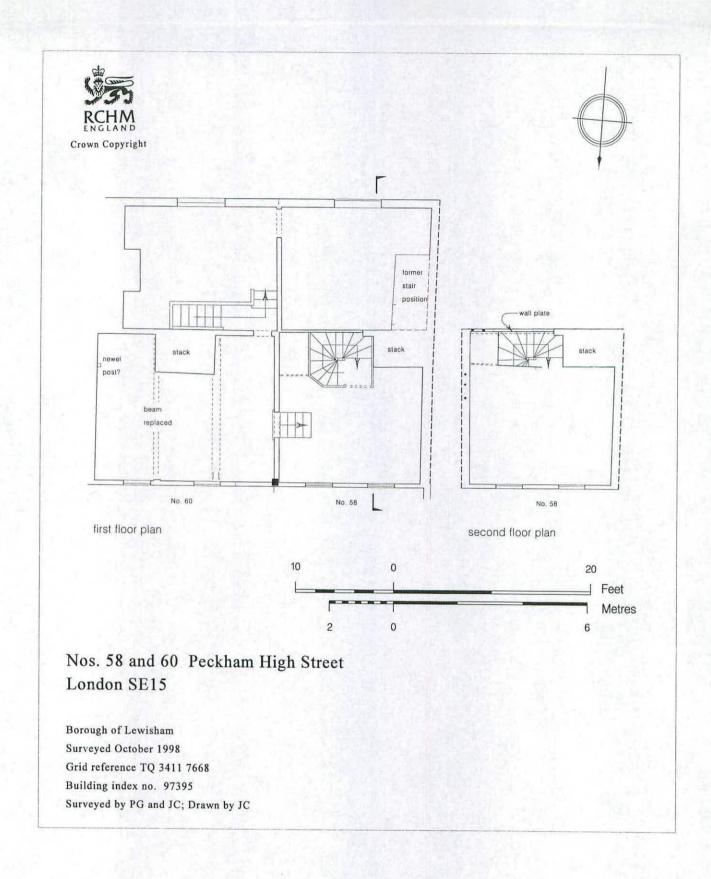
Nos 58 and 60 Peckham High Street, upper-storey plans.
